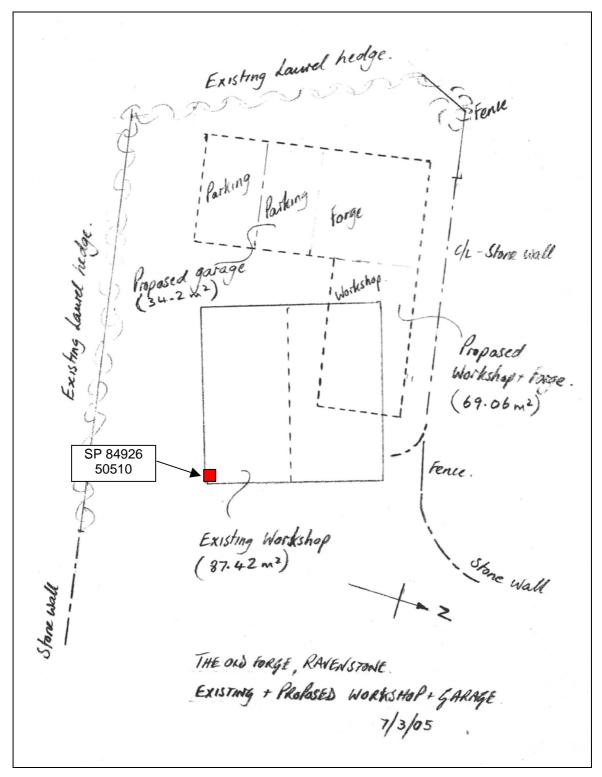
Plan of the proposed Development (*Scale* = 1: 200)
